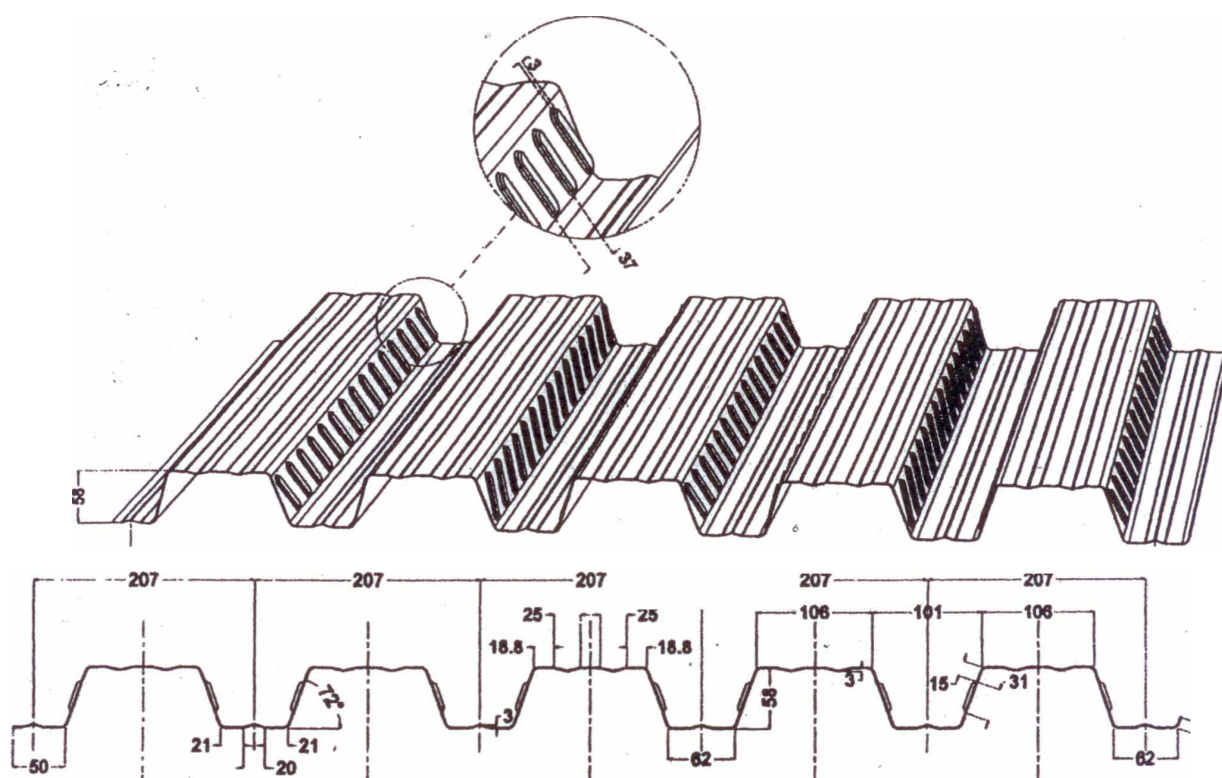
Profiled steel sheeting COFRAPLUS 60
